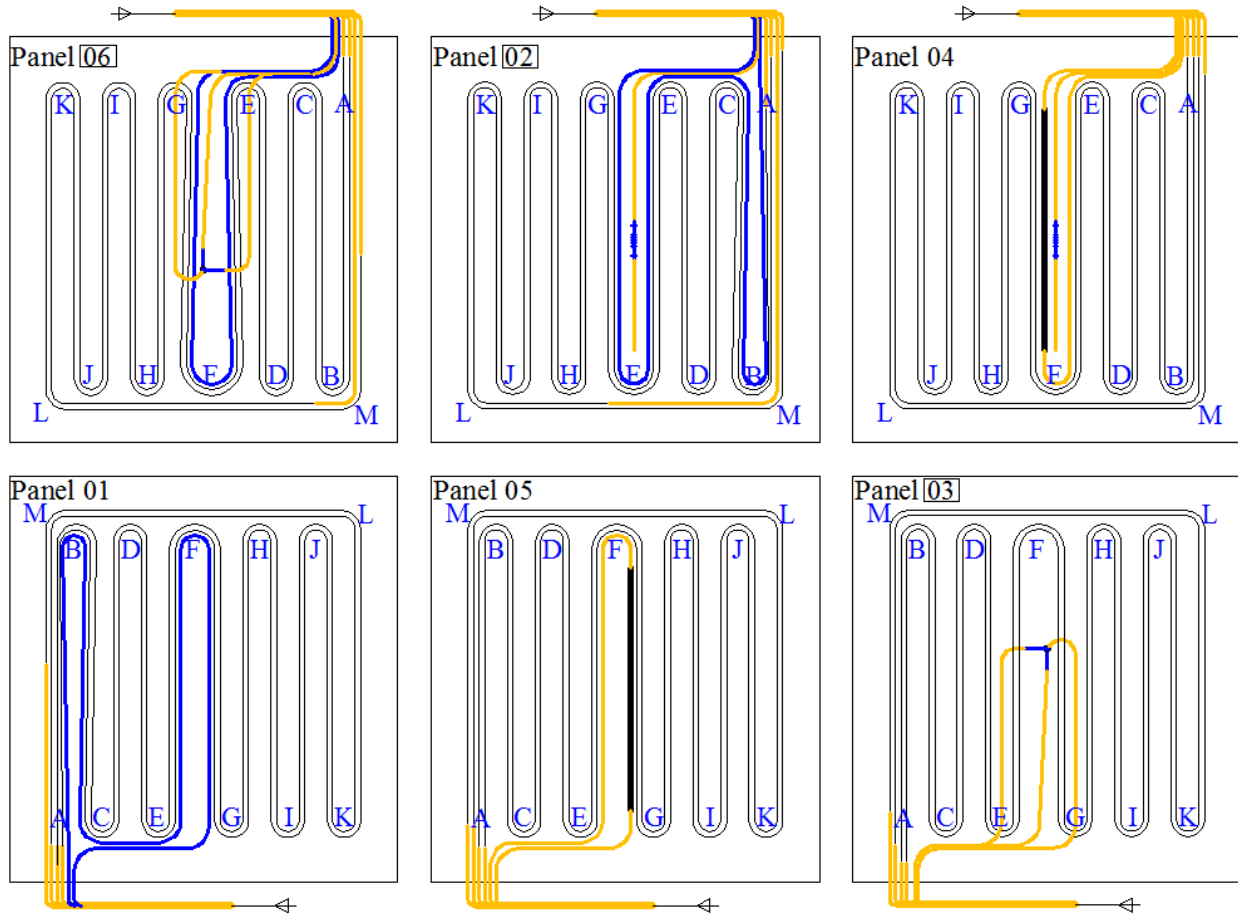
Layout of optical fibers and six concrete overlays.
